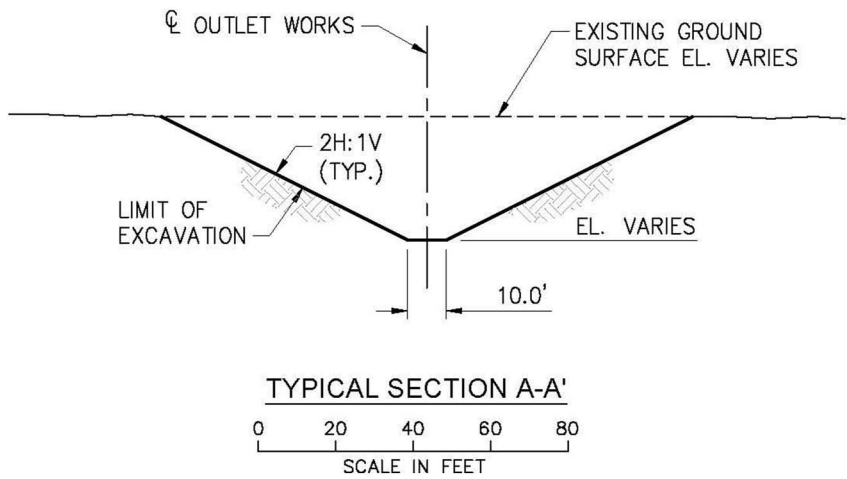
S-6. Typical Section A-A' for a Sloping Excavation
